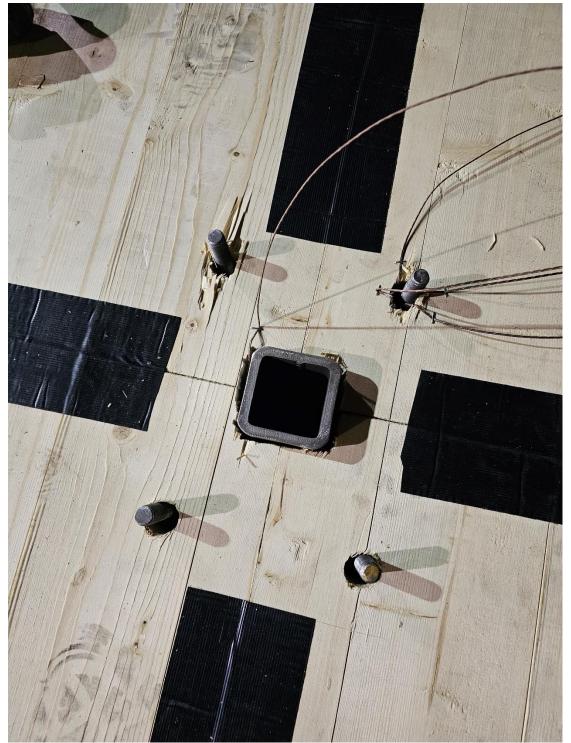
CLT panel joints and steel column prior to steel plate and gypsum installation.
